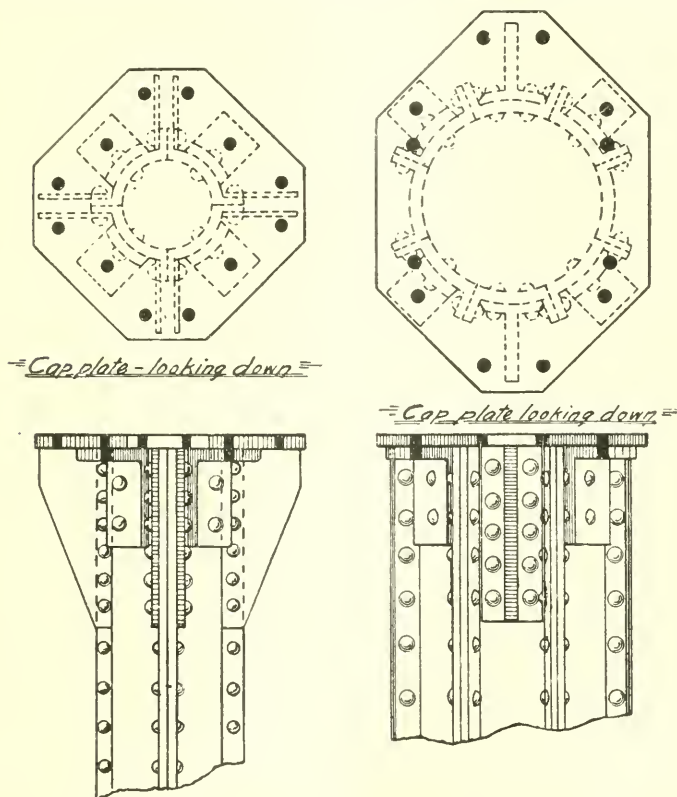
CONNECTION BETWEEN ROLLED BEAMS AND PHOENIX COLUMNS.
